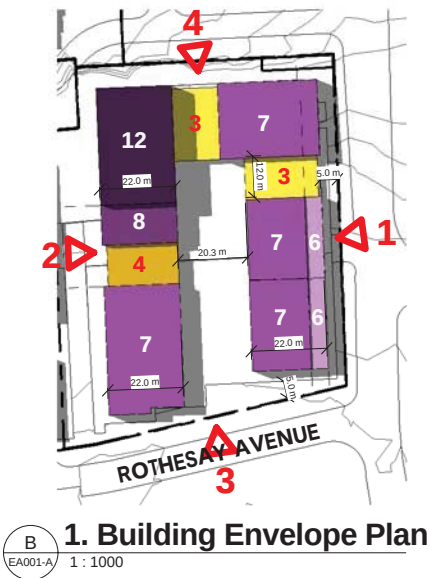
CONCEPT PLAN - STAGE 1 BUILDING ENVELOPE CONTROLS
